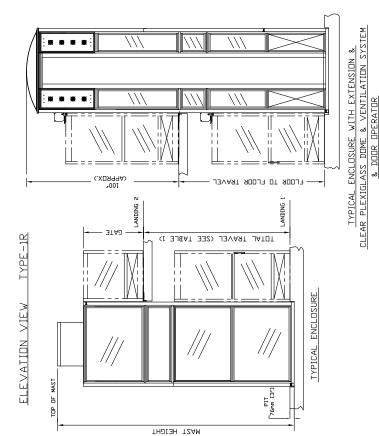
Elevation and plan view, enclosure application (Type 1L)
